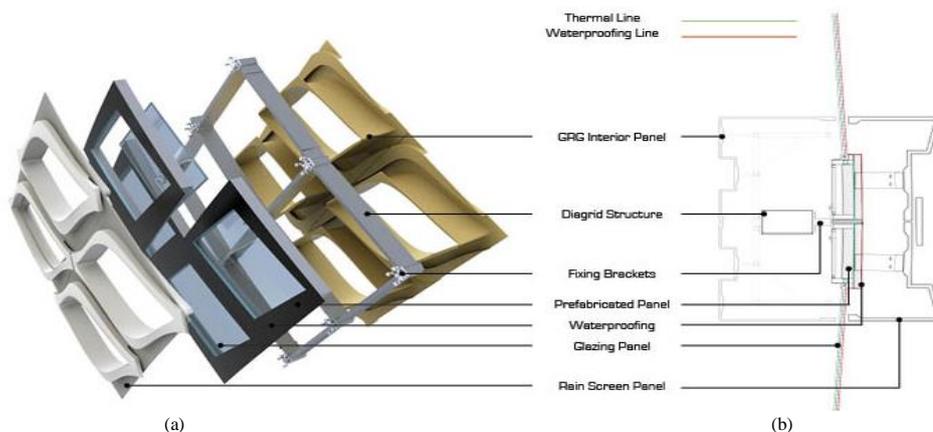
2nd design approach: on-site stick pre-fabricated elements & rainscreen (a) exploded view (b) cross-section detail.
